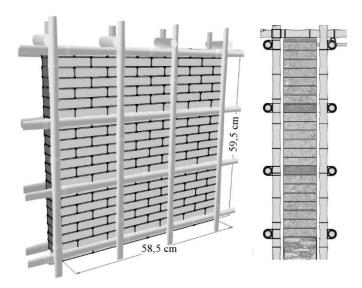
Scheme and section of the bamboo frame on the adobe wall.
